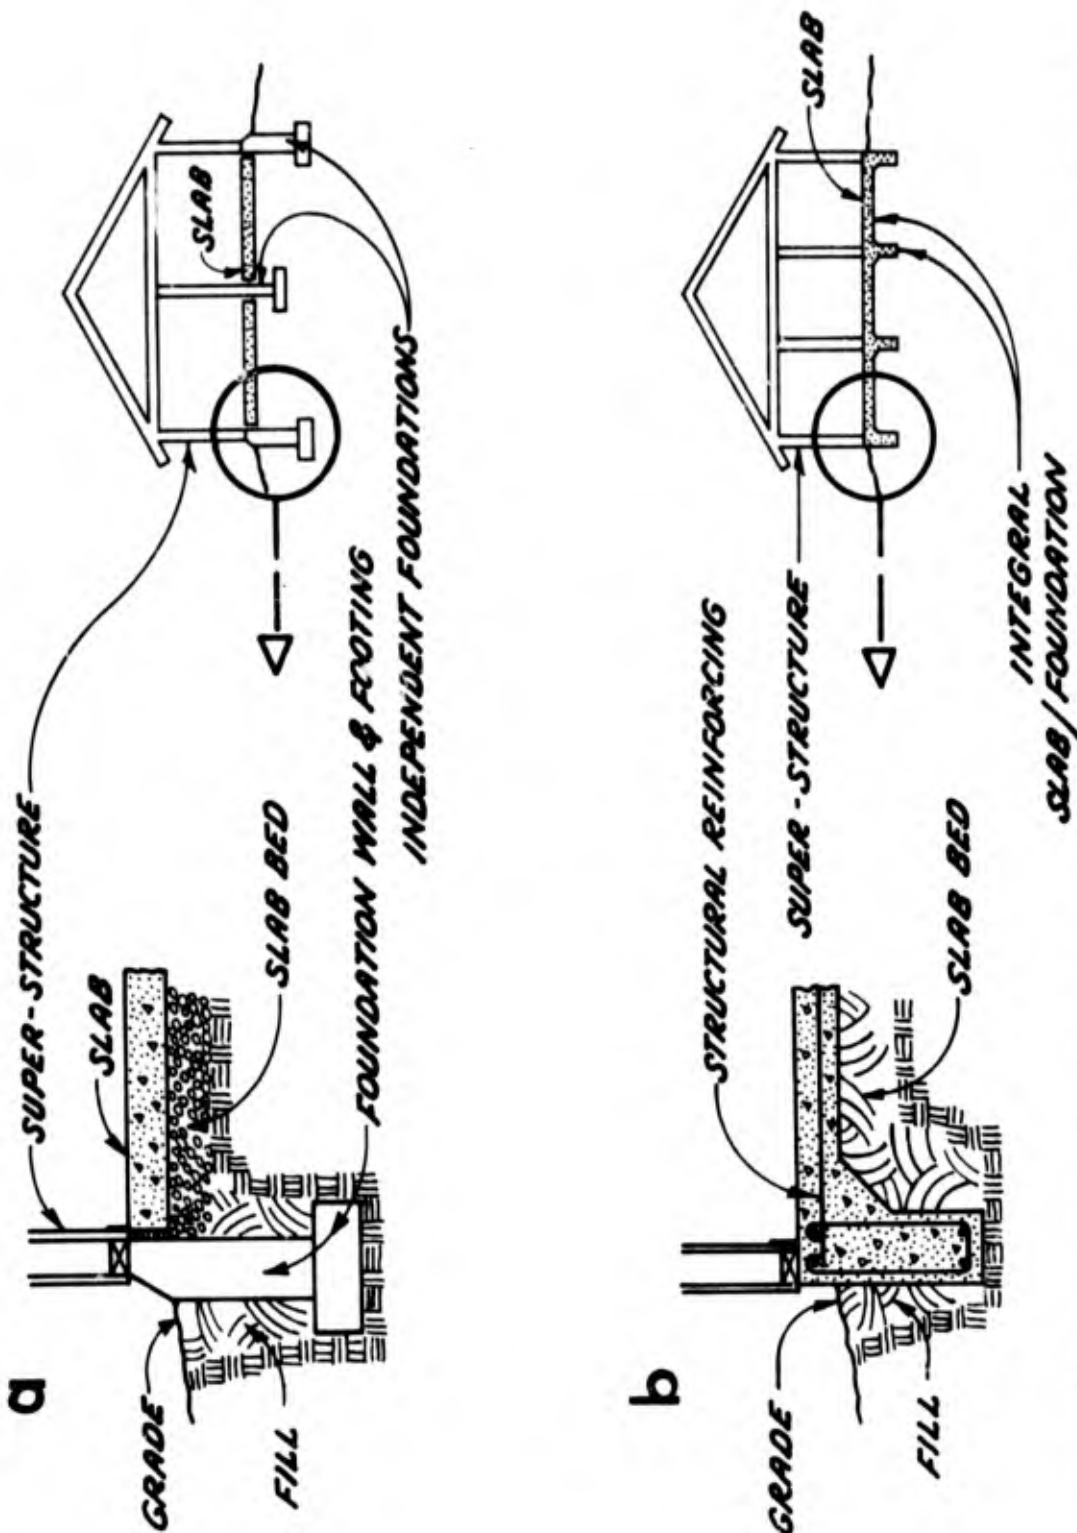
Typical slab-on-ground details. (a) Slab is independent of superstructure and foundation walls; (b) slab is integral with foundation perimeter wall.
